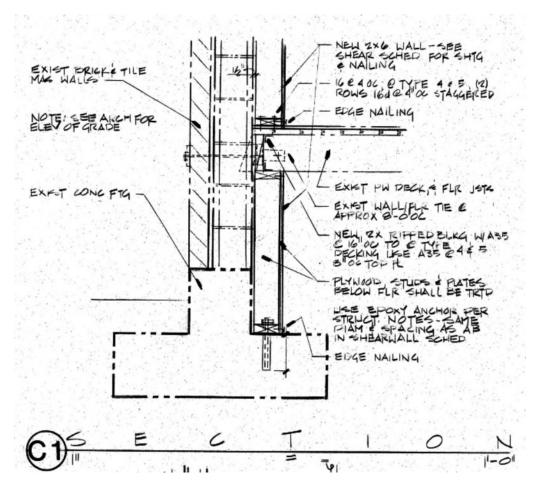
1992 retrofit detail for load path from 1st floor shear wall to crawlspace shear wall to concrete foundation
